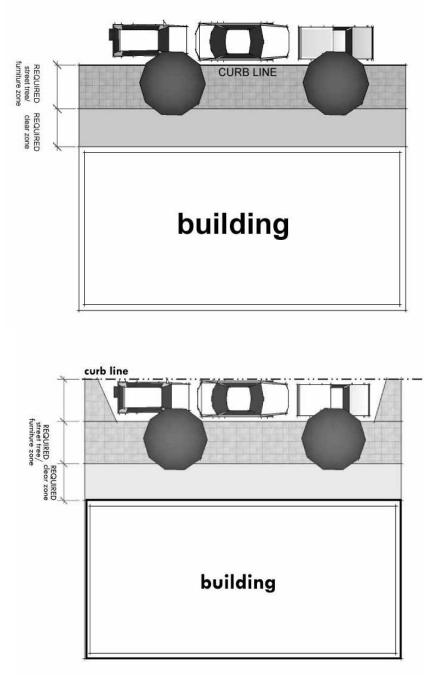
On-street parallel parking options; standard design (above) or a design inside the curb line (below).
